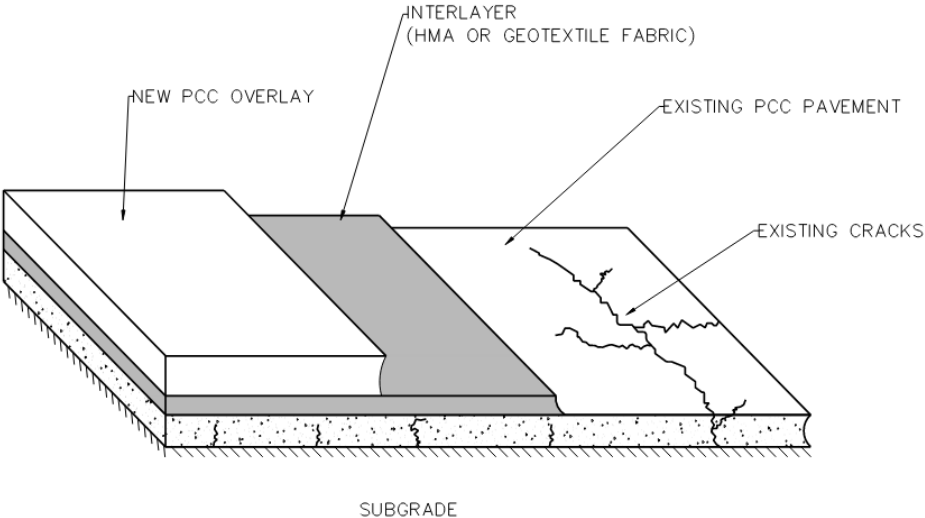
Typical section of pavement with an interlayer and new PCC overlay
